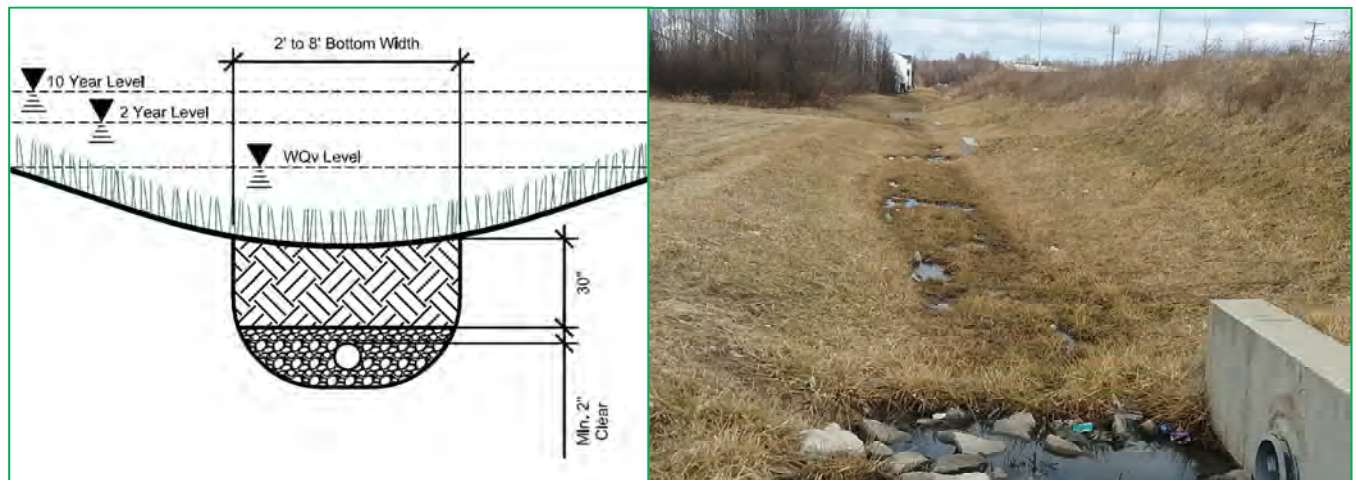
TYPICAL SWALE DESIGN PLAN VIEW (LEFT) AND TYPICAL SWALE INSTALLATION (RIGHT)
